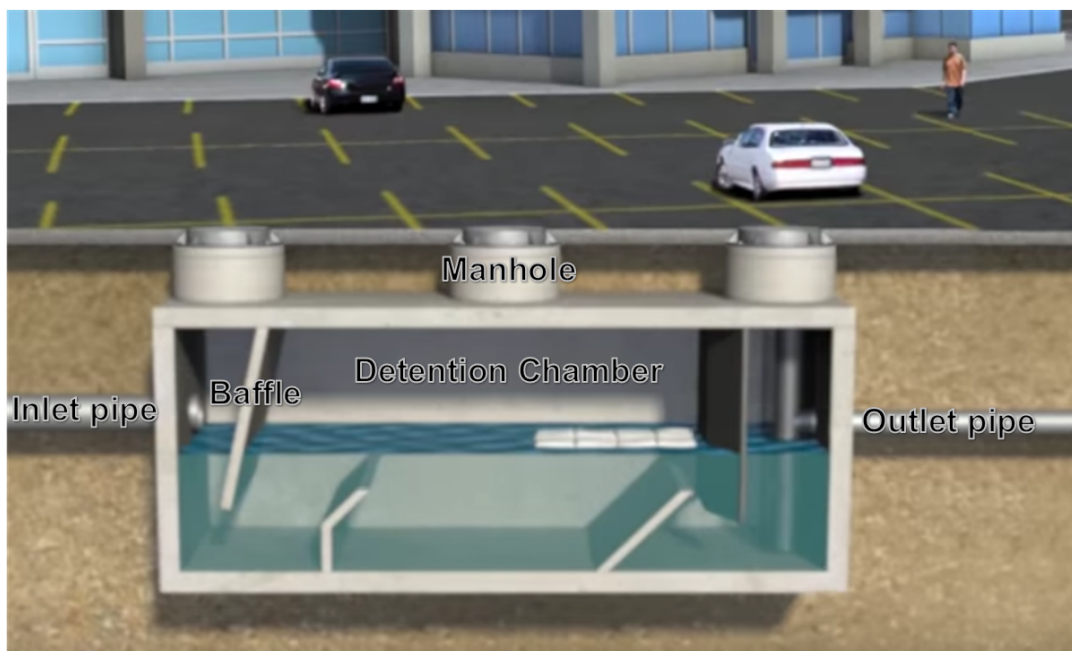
Underground storm vault with inlet pipe, outlet pipe, manhole and detention chamber. Adjusted by authors from [57].
